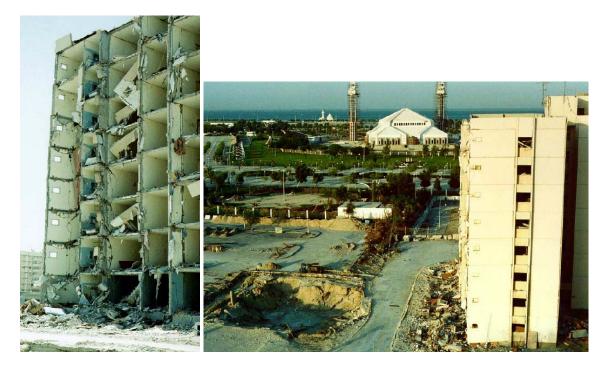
Blast Damage to Building 131. [17] Left: Front View. Right: Crater (85 feet by 35 feet deep).
